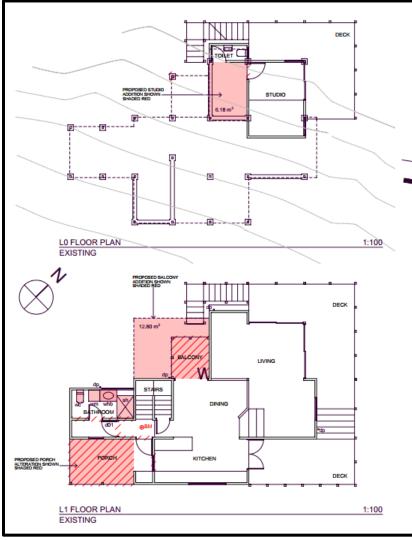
Existing floor plan. Studio addition will be located where an existing covered deck area is. Proposed porch alteration creates breaches under the DP.
